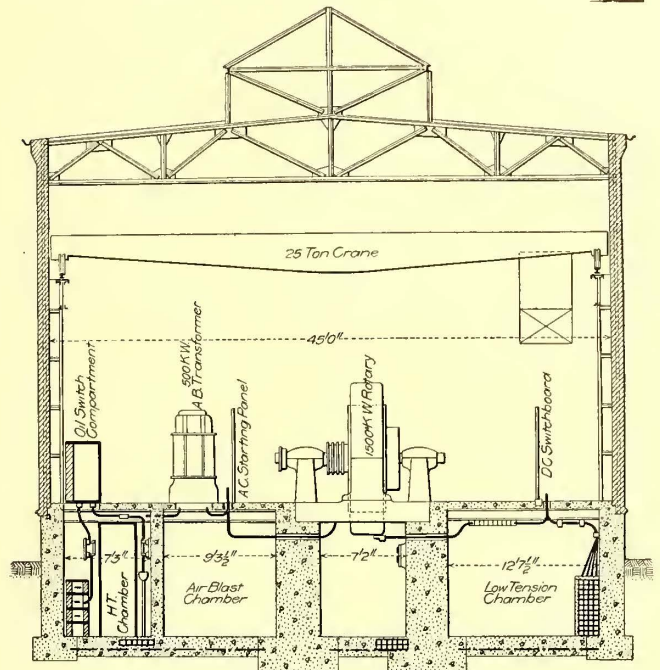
CROSS-SECTION OF CENTRAL SUBSTATION
